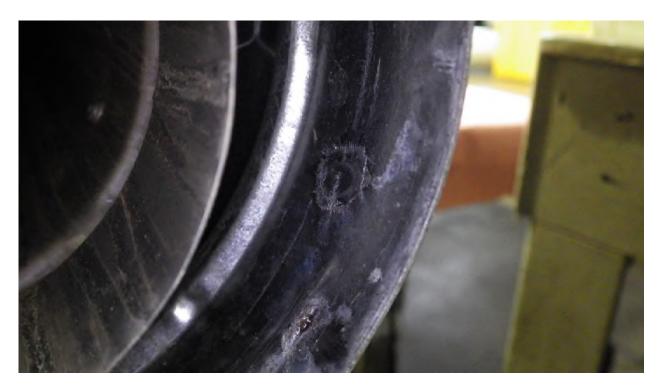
Photograph of electrical damage on the inside surface of the flue piping at a location where adjacent sections of flue piping overlapped.
